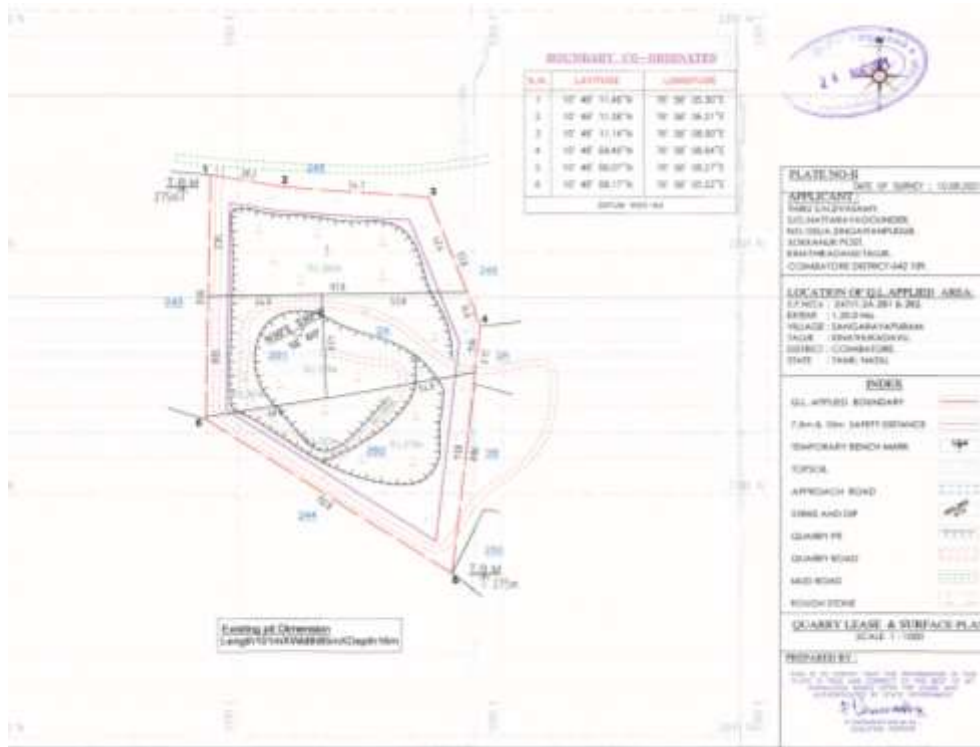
QUARRY LEASE PLAN & SURFACE PLAN
